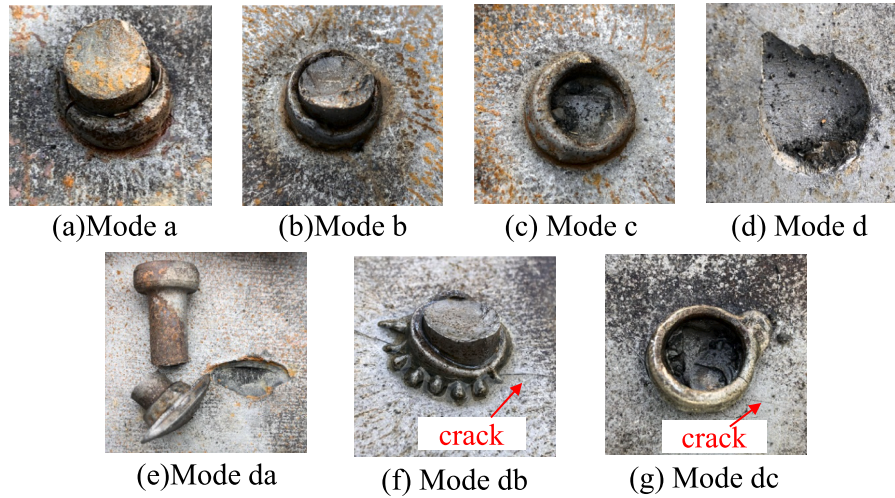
Fatigue failure modes of the short-headed stud connectors and the steel deck plate.
